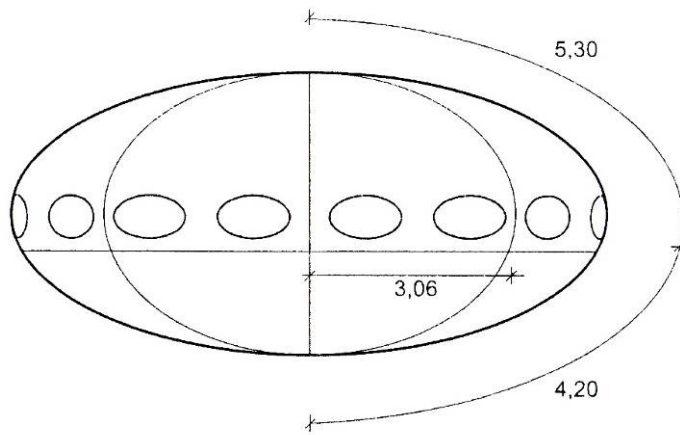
Dimensional drawing of the exterior. (Genzel & Voigt 2005)
